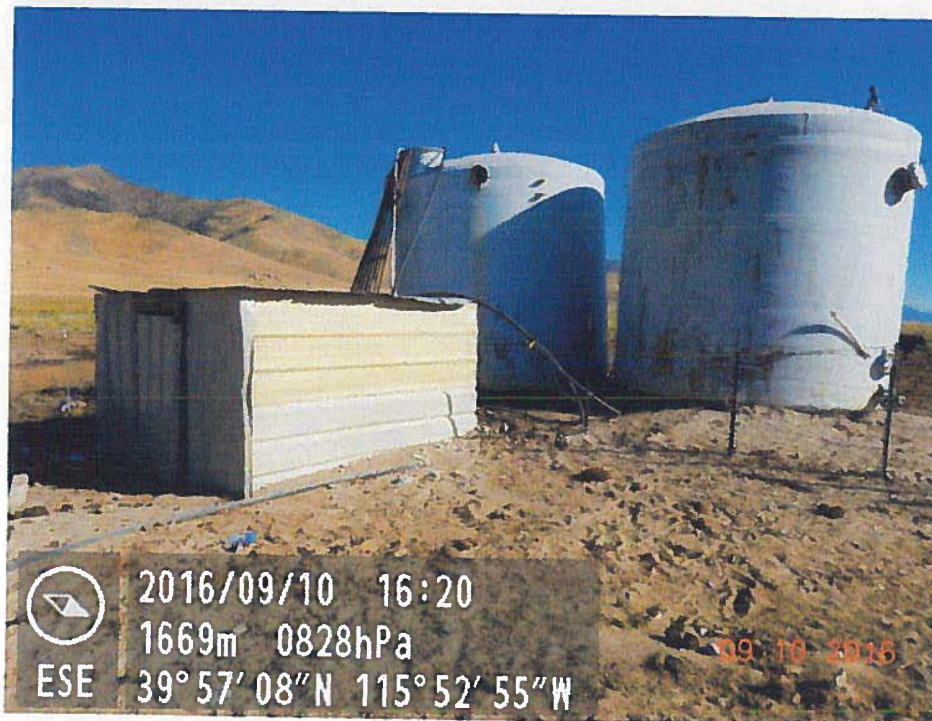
Unpermitted stockwell, Log 91291, near Willow Field, looking SE.
